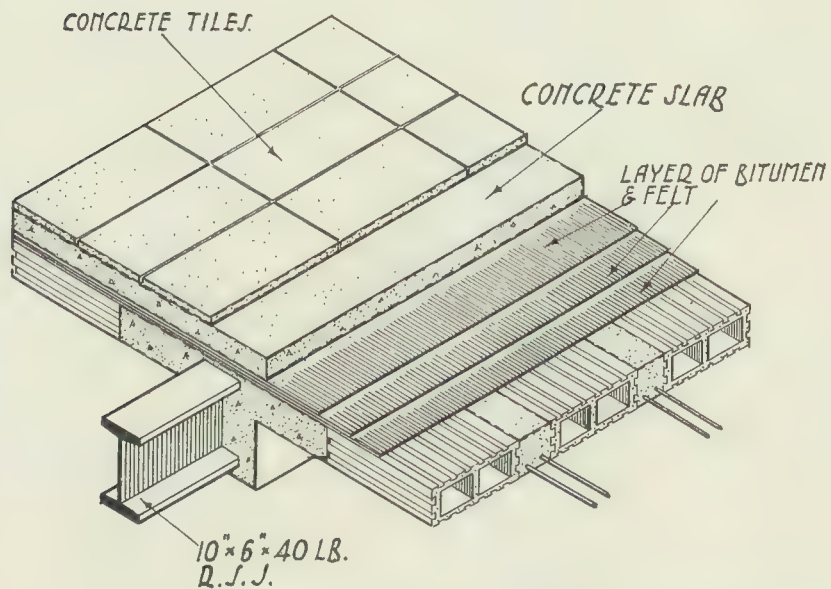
CONSTRUCTION OF FLAT ROOF SHOWING ARRANGEMENT OF INSULATING LAYERS
